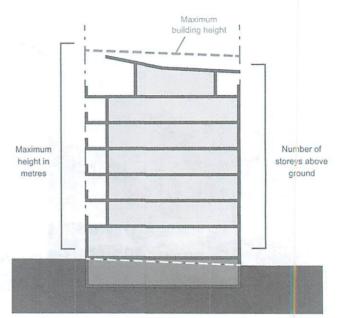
C.1 The total height of a building informs the number of storeys possible in a development. Floor to floor heights vary depending on the use e.g. shops and offices are typically higher than residential apartments
